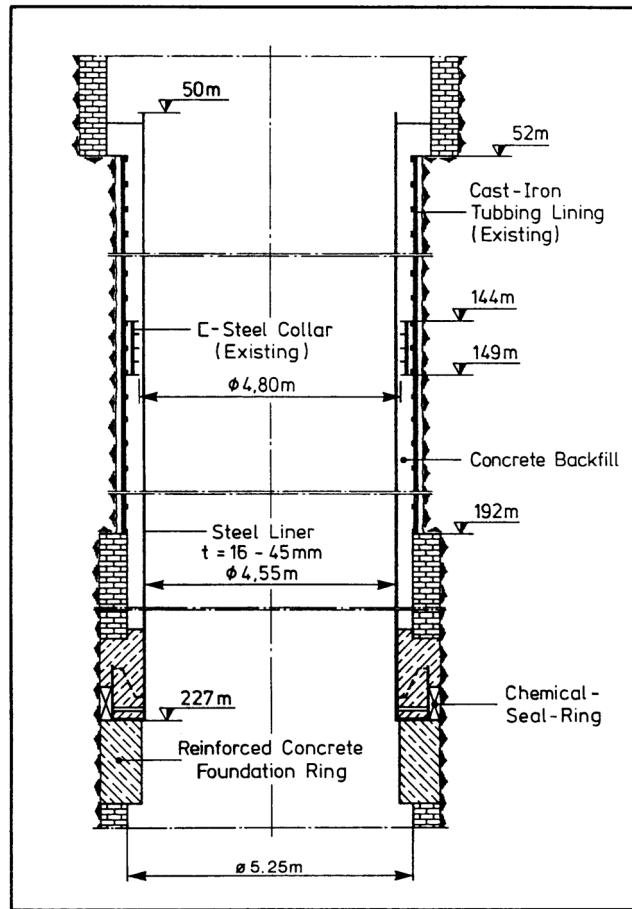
Shaft Salzdetfurth 1 New Watertight Lining System
